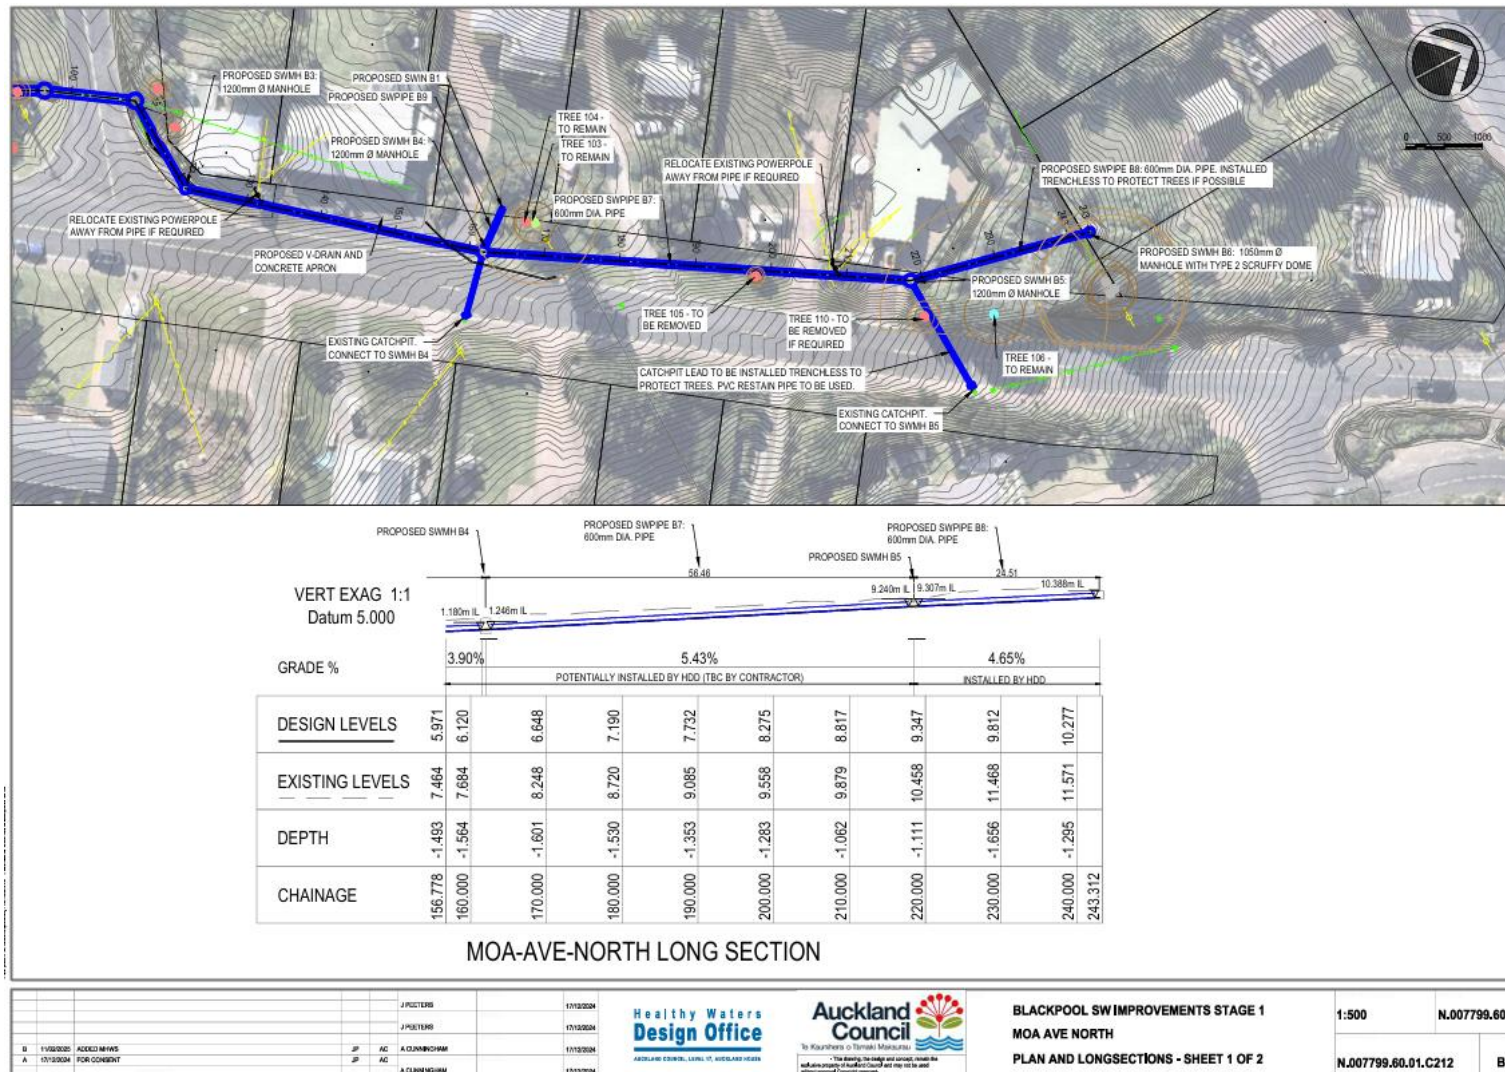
Blackpool SW Improvements Stage 1 Moa Ave North Plan and Longsections – Sheet 1 of 2
